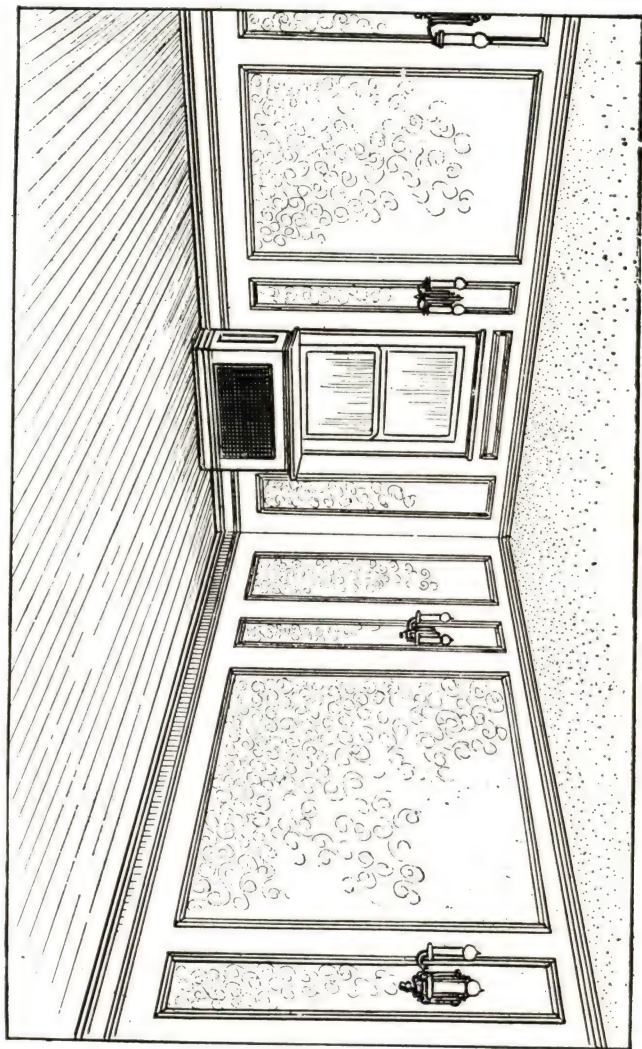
An Interesting Layout of Wall Panels Produced with Mouldings and Wallpaper Centers in a Living Room.
